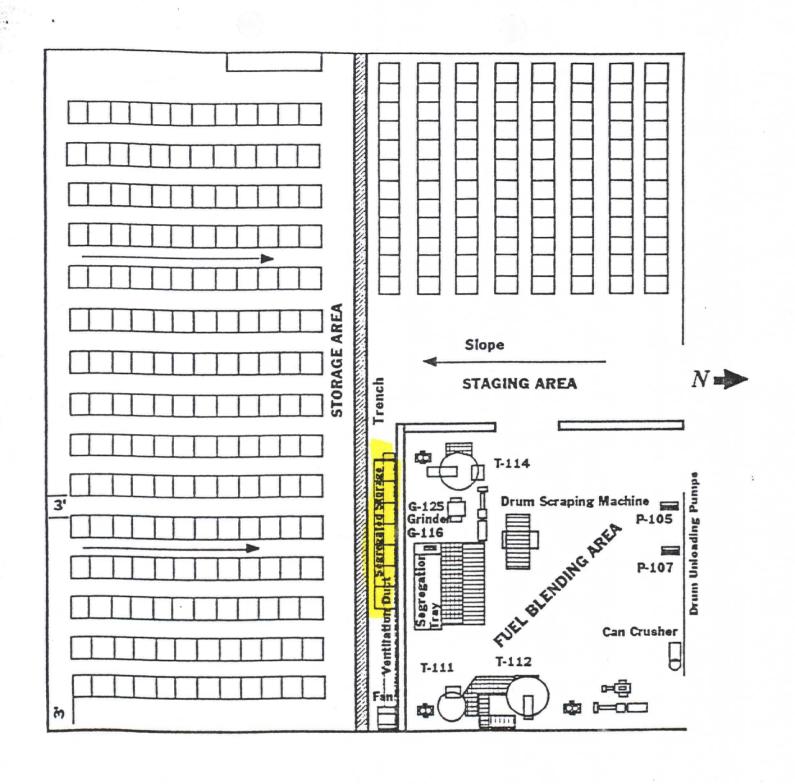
Arrangement of Pallets within the Drum Storage Building
